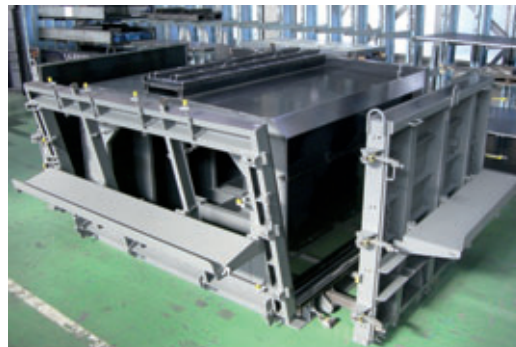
, 3b: Examples of retaining wall molds used in Japan
